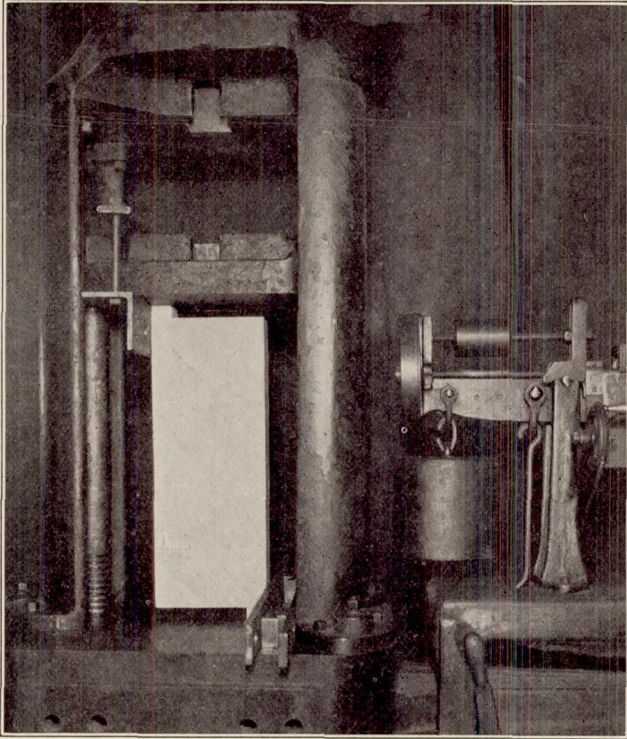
One method used to apply shearing loads to relatively short beam sections. (The dimensions of the test pieces appear in Table VII)
